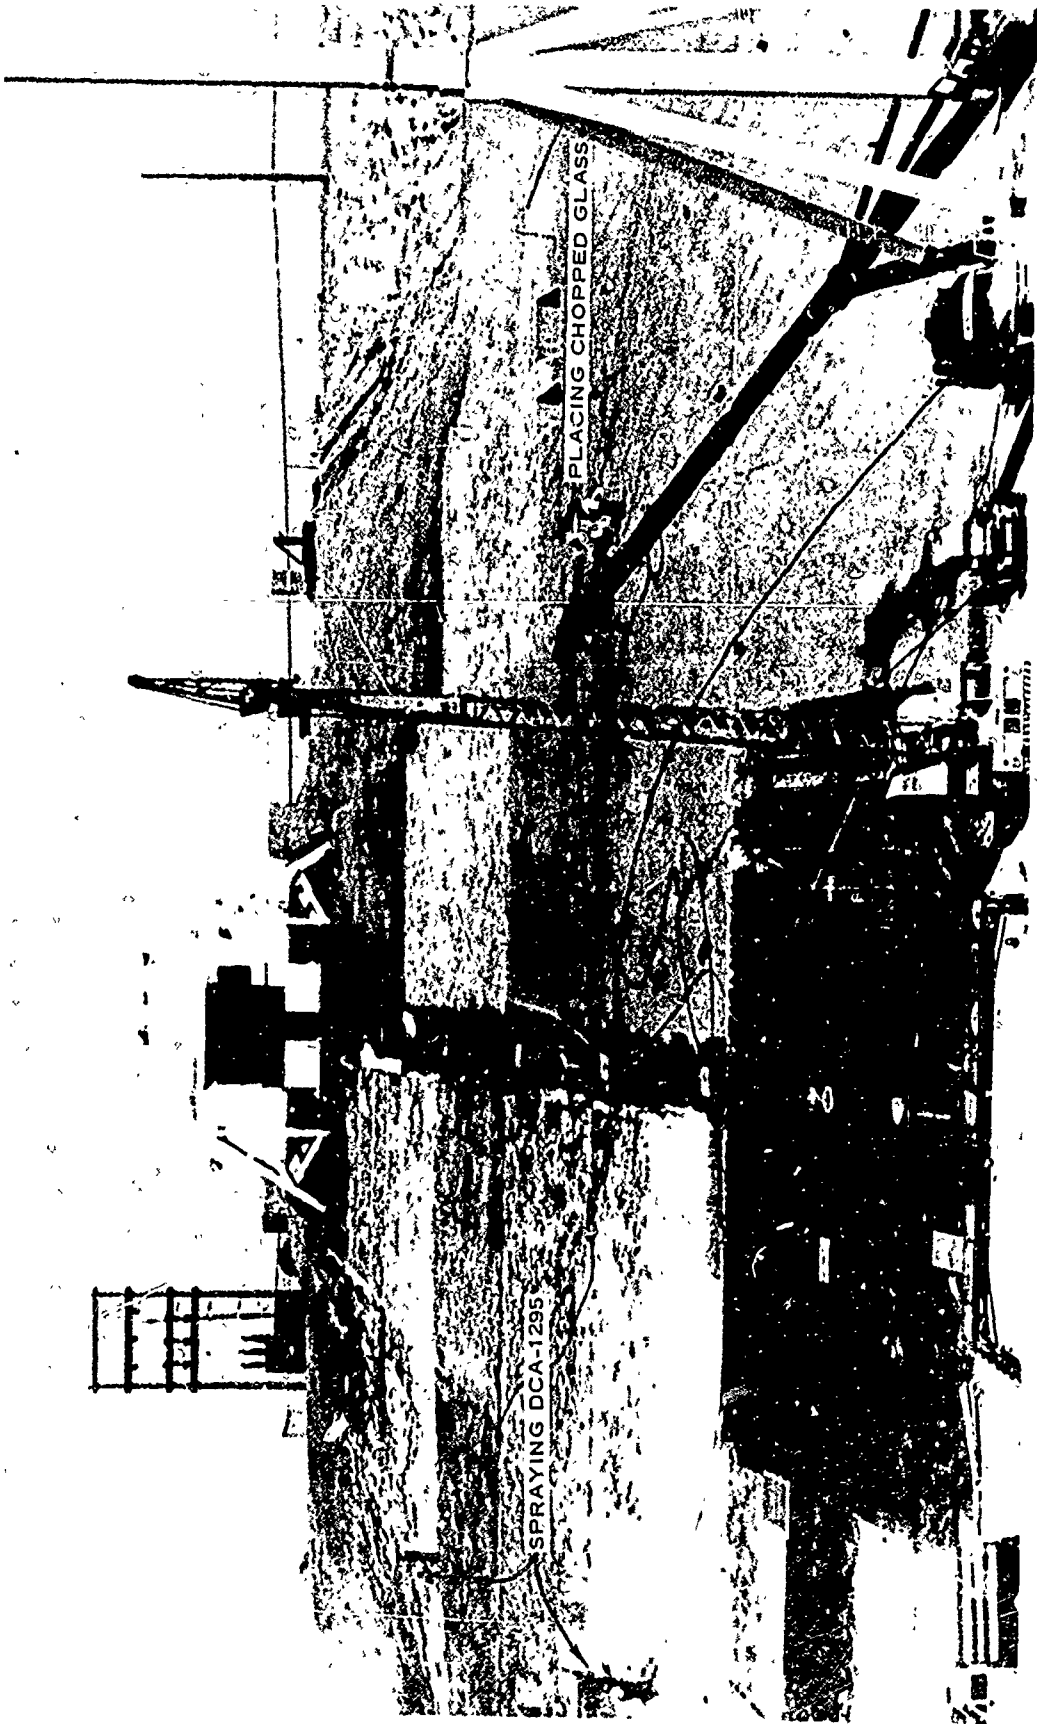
Placing chopped glass and spraying DCA-1295 on west slope
